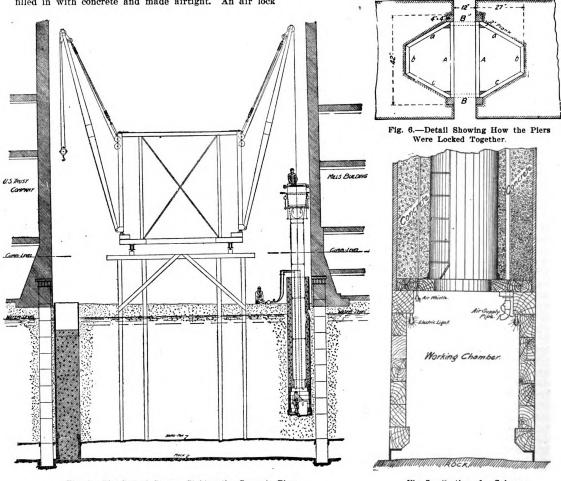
The Second Stage.-Sinking the Concrete Piers.
